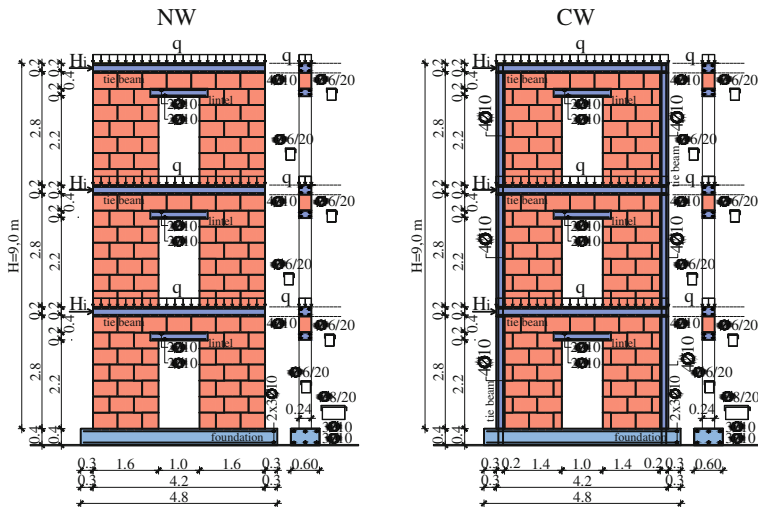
Basic data about the analyzed masonry walls. a Unreinforced masonry wall. b Confined masonry wall
